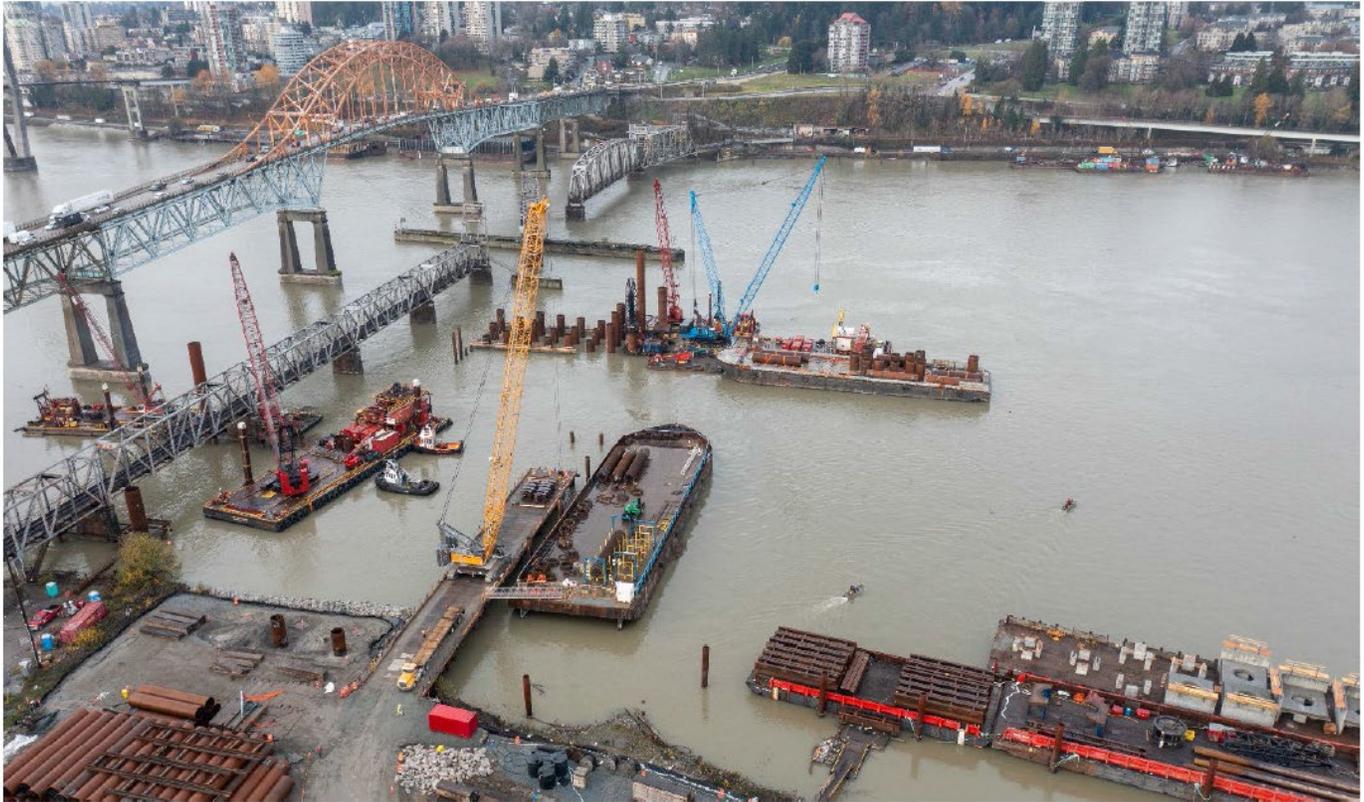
PILE INSTALLATION AT PIER S2 (BOTTOM LEFT) AND PIER S1 (TOP MIDDLE)
